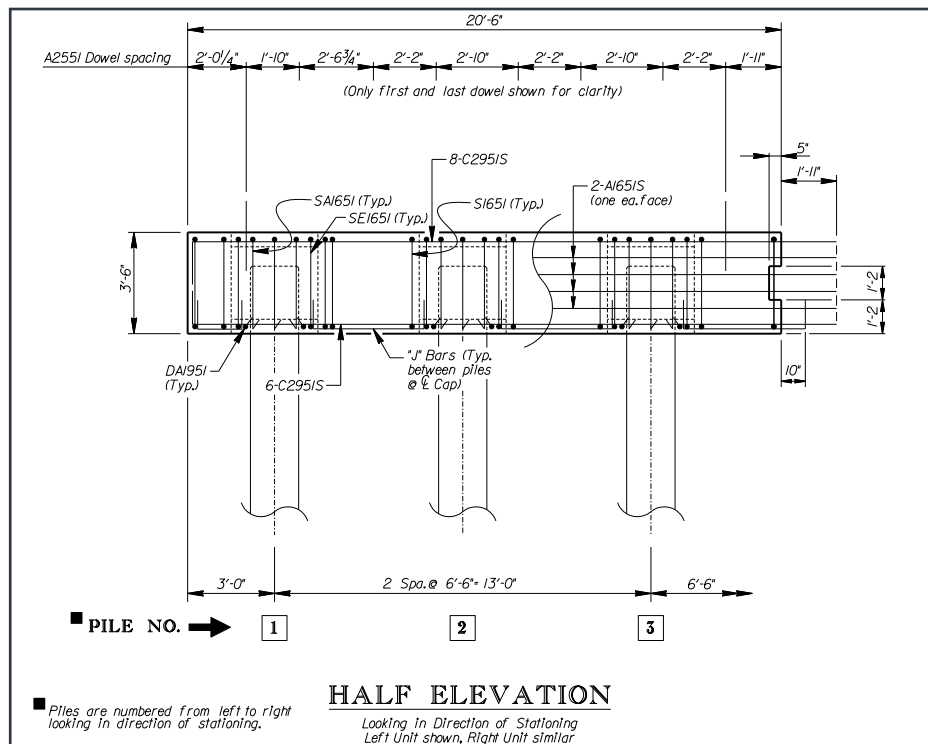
Precast pile to CIP cap beam connection in South Carolina
